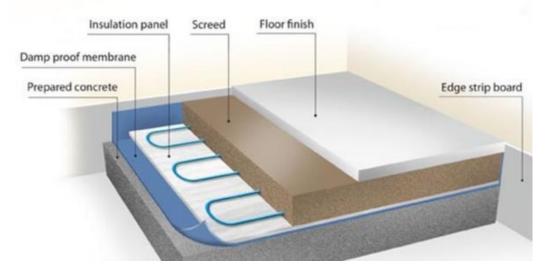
Hydronic underfloor heating (CTS Plumbing & Building 2017)
